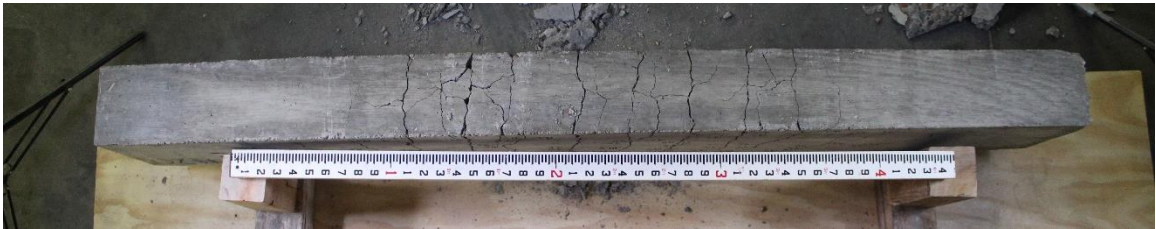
Mixture 1 (100PC) beam #20: concrete beam bottom view.
